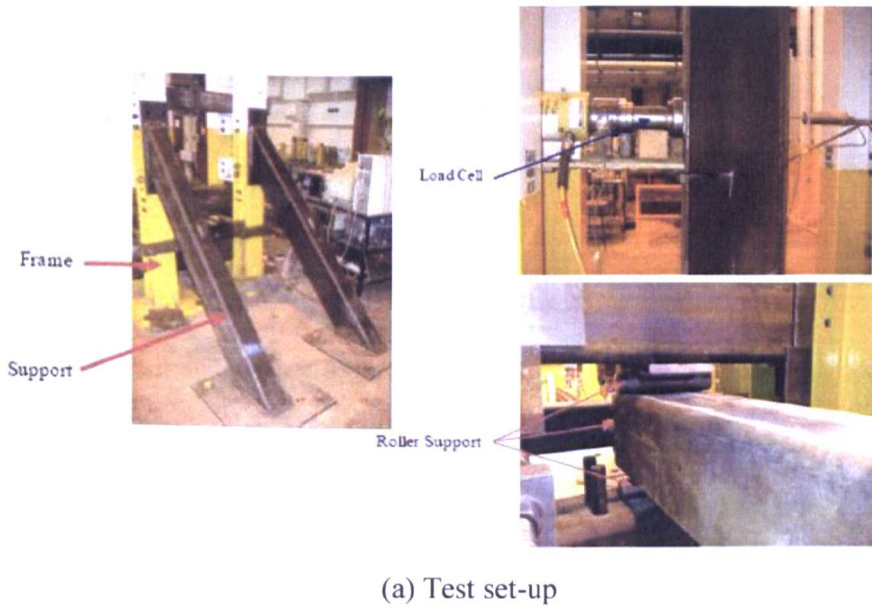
Representative test set-up for blind-bolted (Lindapter Hollobolt) beam-to-column moment connections under monotonic loading (Wang *et al*, 2009)
